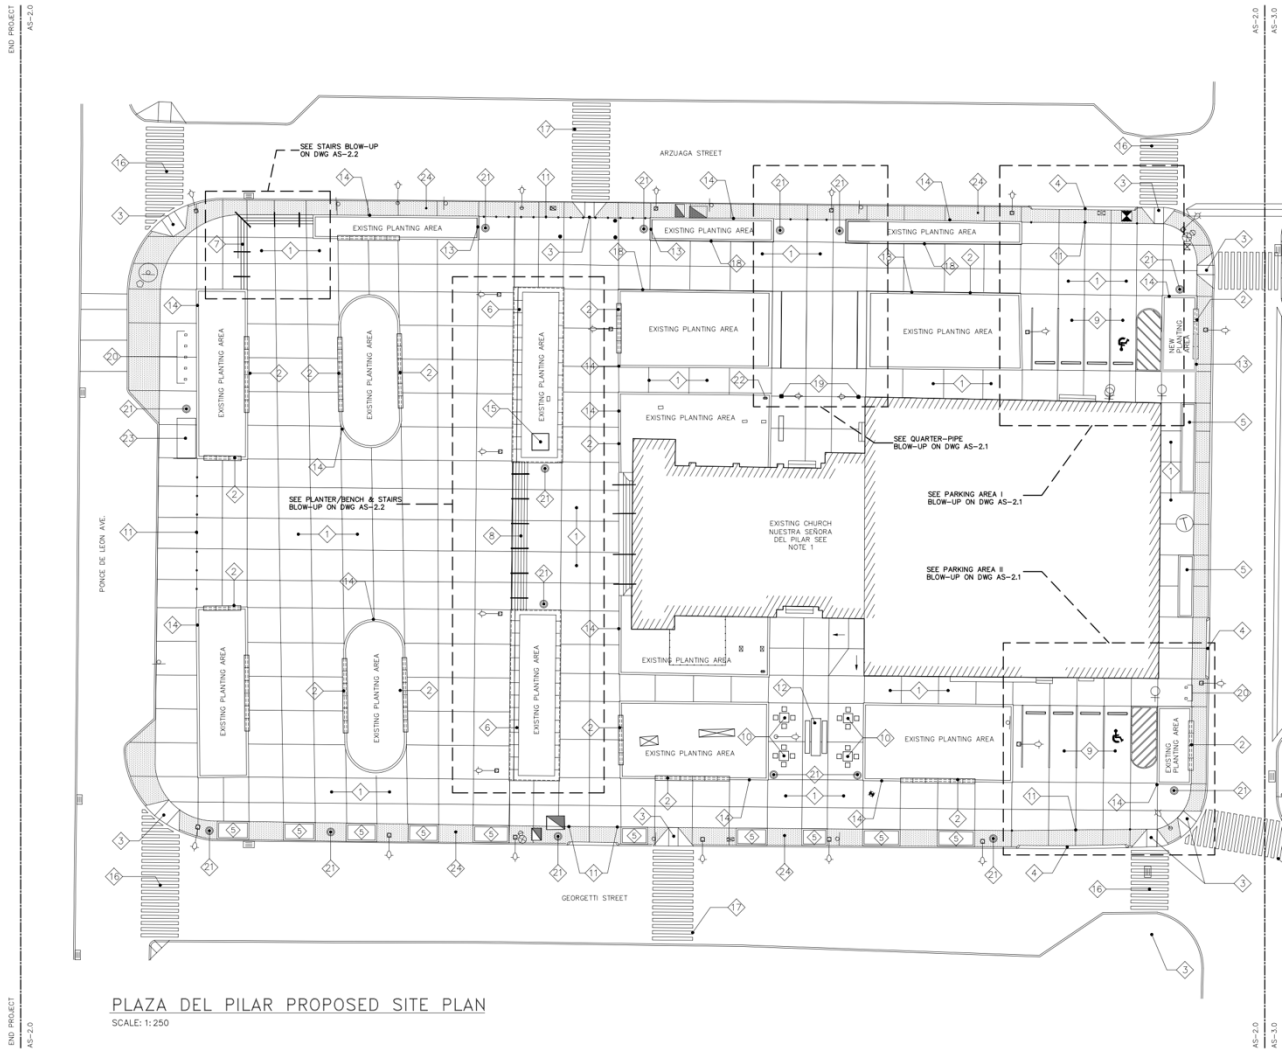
Proposed site plan for Plaza del Pilar (Source: Drawing AS-2.0, Hernández-Bauzá PSC Architects, 2024).
